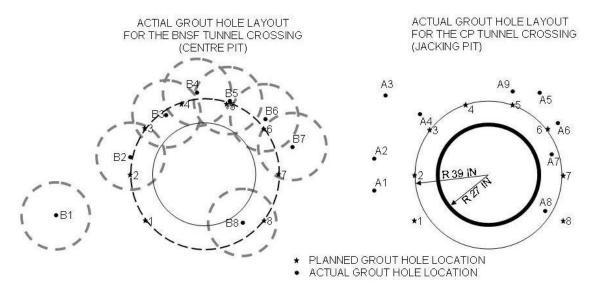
Grout hole layout for the BNSF and CP railway crossing
